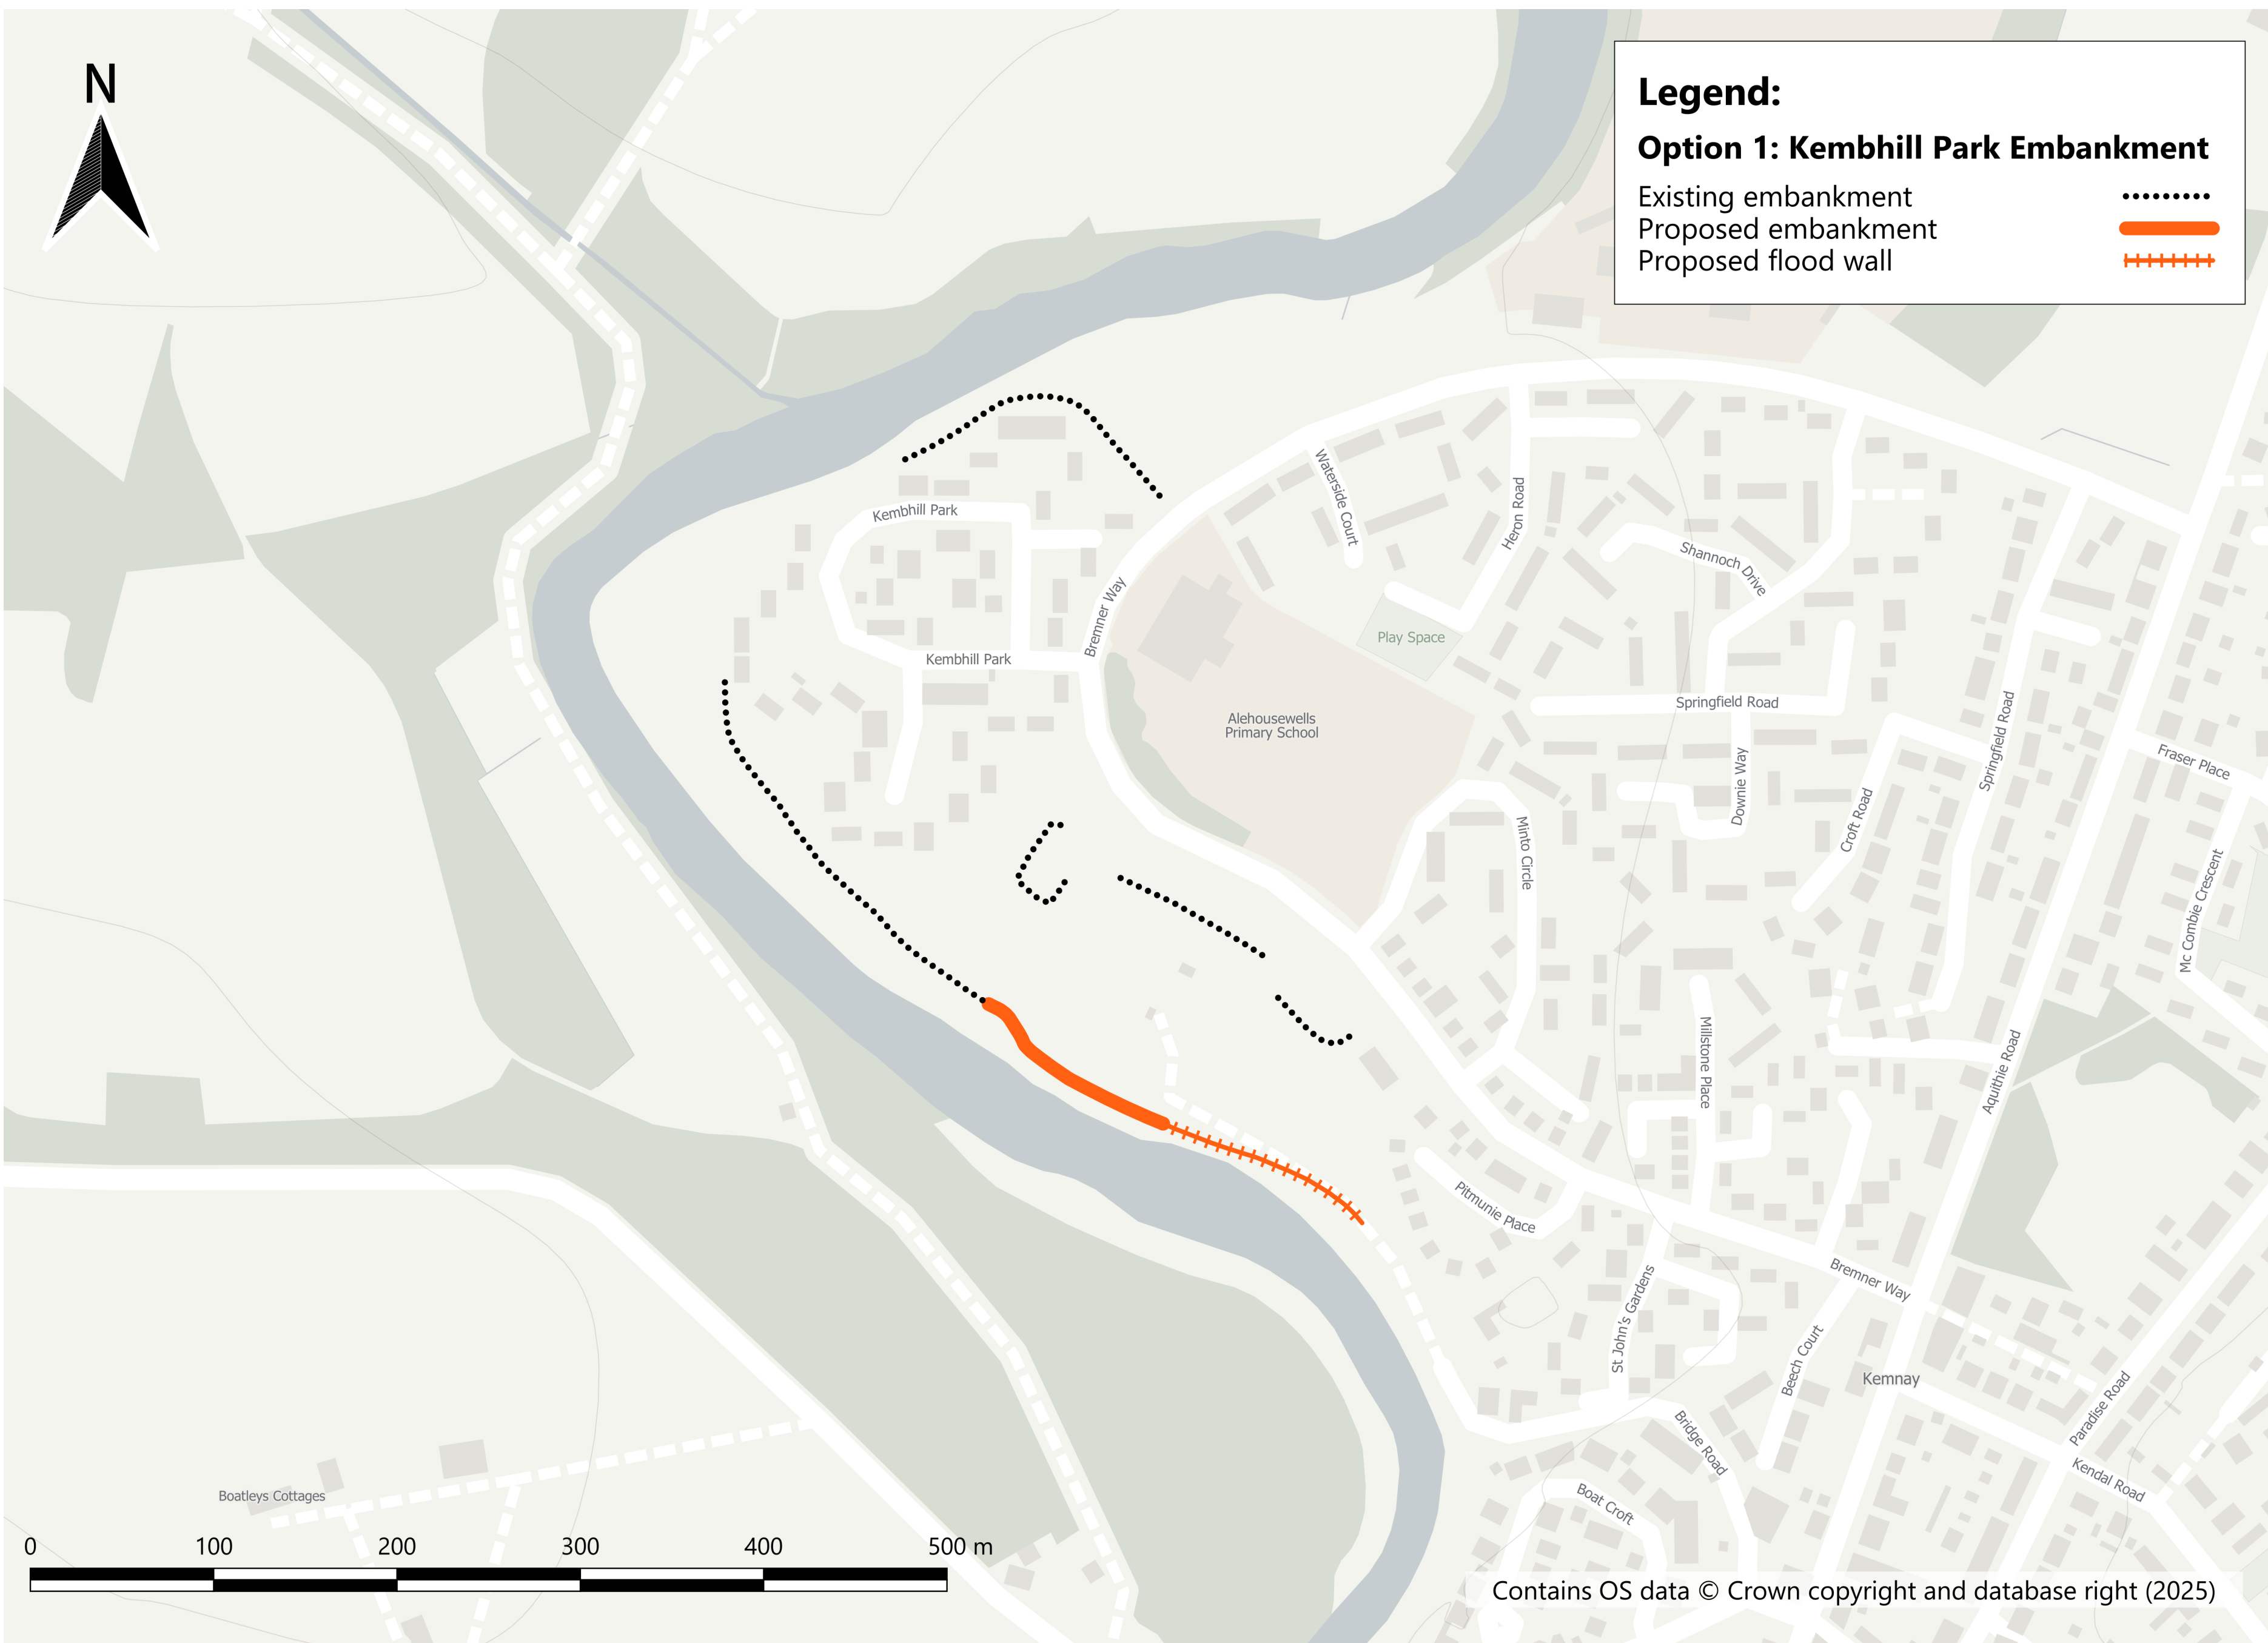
Option 1, embankment and flood wall at Kembhill Park
